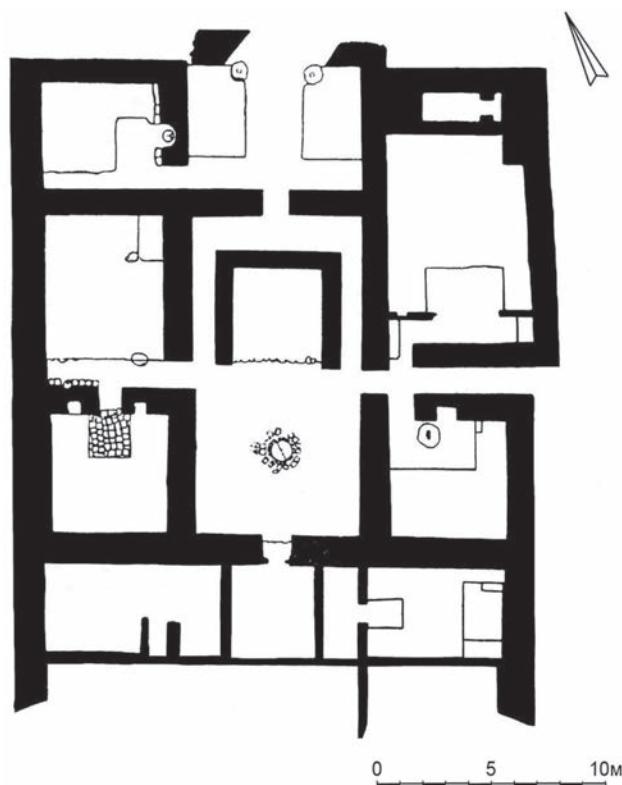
Building on the Akchiy settlement, plan (Zaurova 1977)
